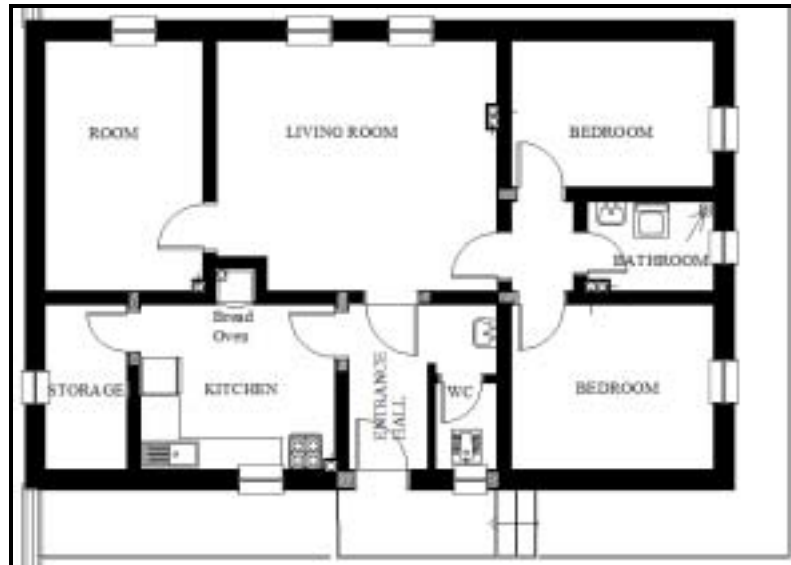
Original Plan of the PDH with *Typical Design*-Type 2 (103.75 m²)
